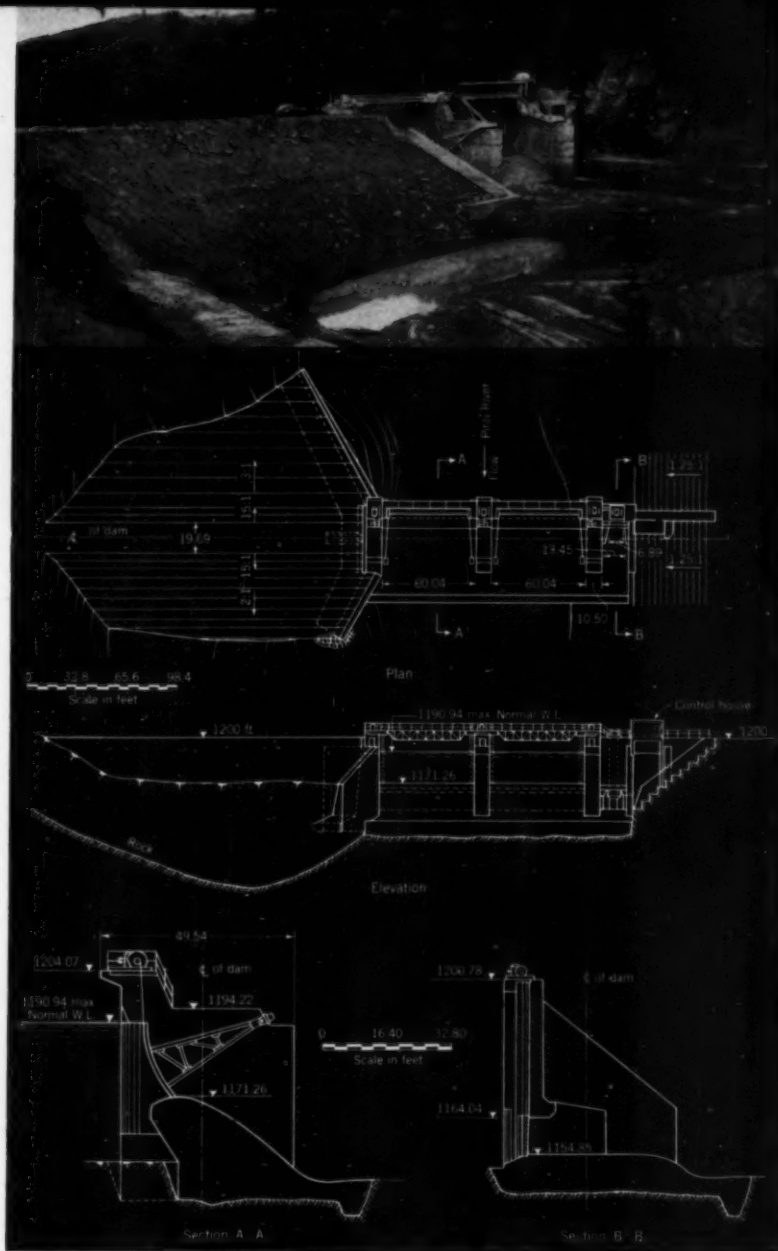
SANTANA DAM (photo, plan, elevation, and cross sections above) is small structure used to close Santana Reservoir. Gates are exactly like those of Santa Cecilia Dam. Spillway section is designed to handle small discharges when Vigario pumps may not be able to divert all of Pirai flood waters. Photo at top of page shows earth fill and spillway section in place.
